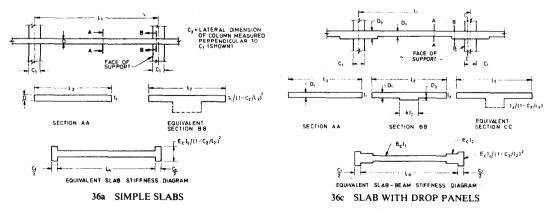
Idealization for Column Types of Slab Elements for Continuous Slab-Beam Stiffness
